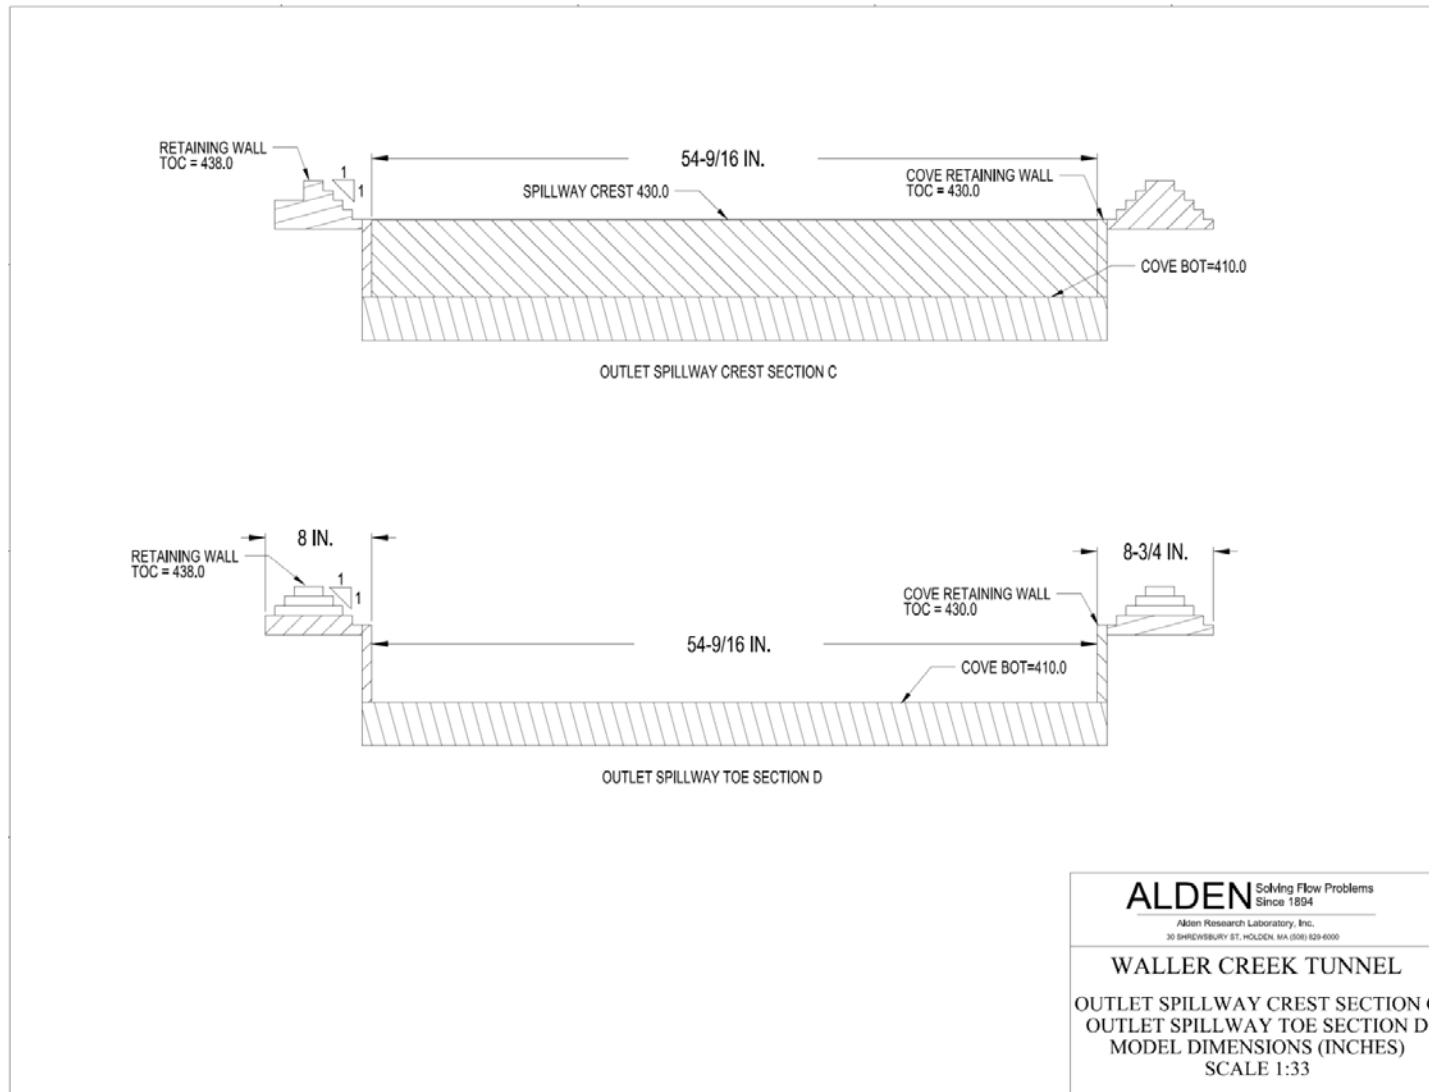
Waller Creek Tunnel Project; 1:33 Scale Model Outlet Dimensions –Sections C and D
